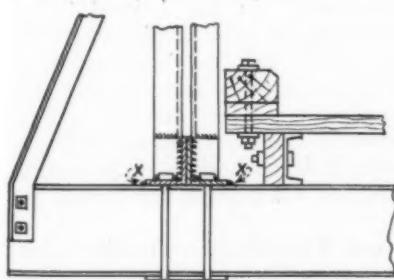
Excessive Deformation of Chord Angles Checked by Welding
